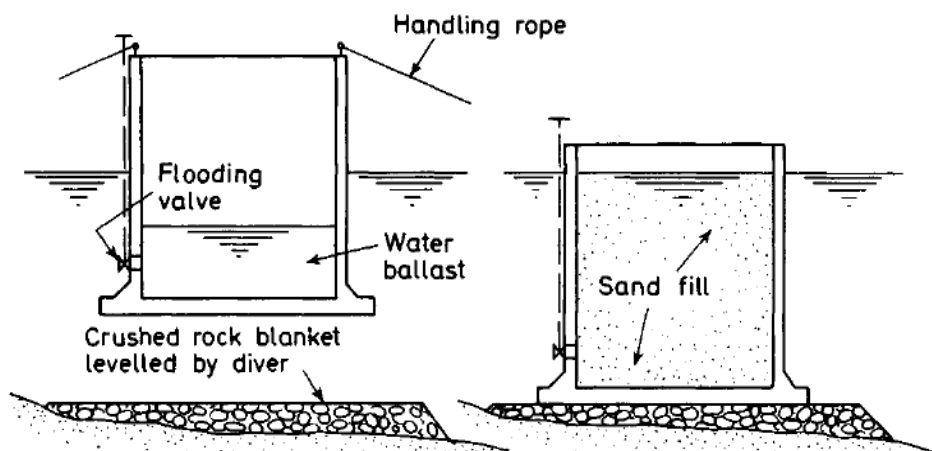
TYPICAL CAISSON – SECTION VIEW
